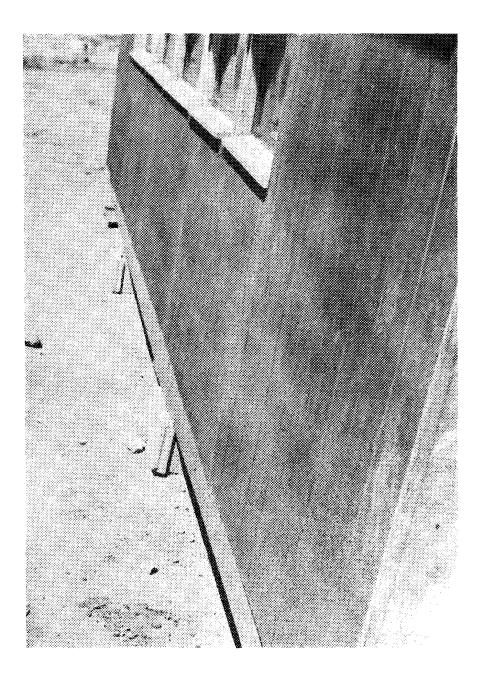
Beach Cottage, Cook's Beach (near Sask. Beach, Sask.). Wall facing southwest shifted back on foundations. (July 26, 1957).
